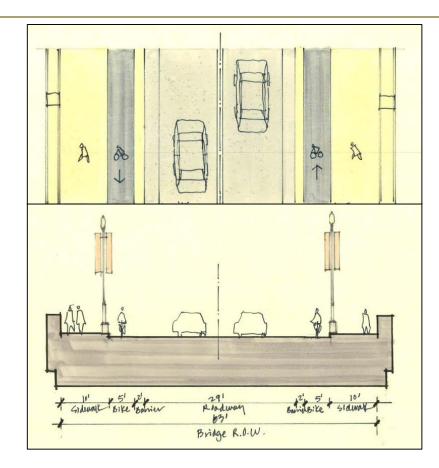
Derby-Shelton Bridge Segment Option 3 Cross Section
